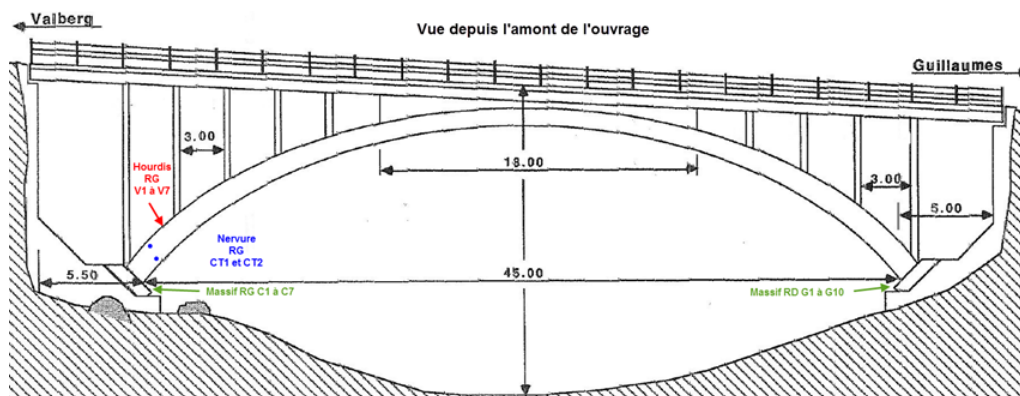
Elevation of the bridge with the locations of the samples taken in 2018
